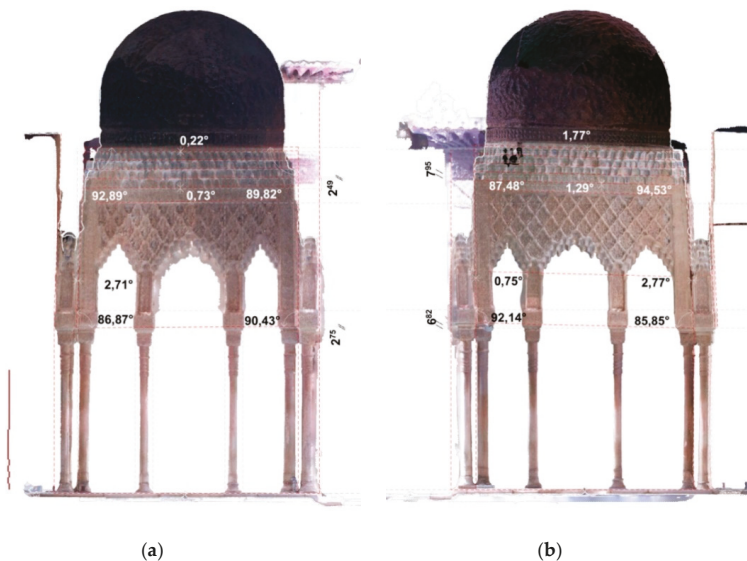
Sections deformations [author’s own drawing]: (a) Western pavilion; (b) eastern pavilion.
